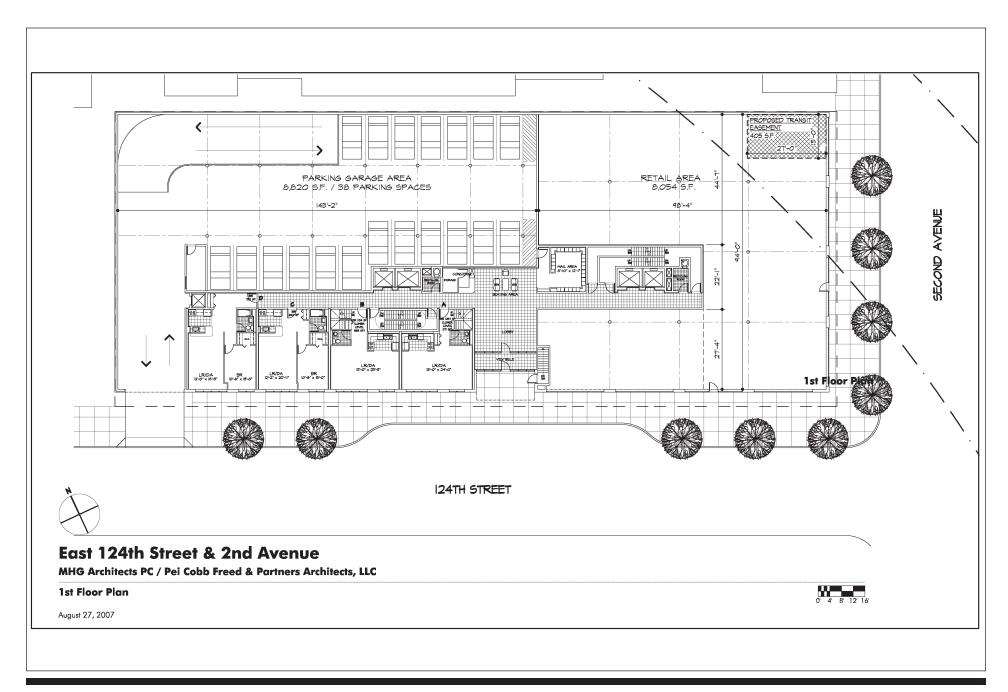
Ground Floor plan of Projected Development Site 26
